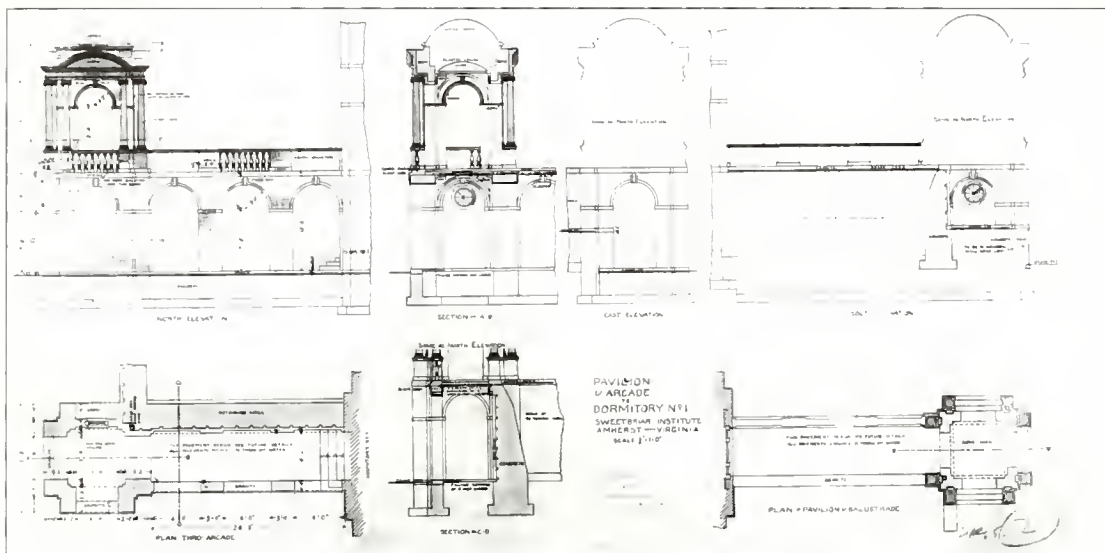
PAVILION/BELL TOWER AND ARCADE
